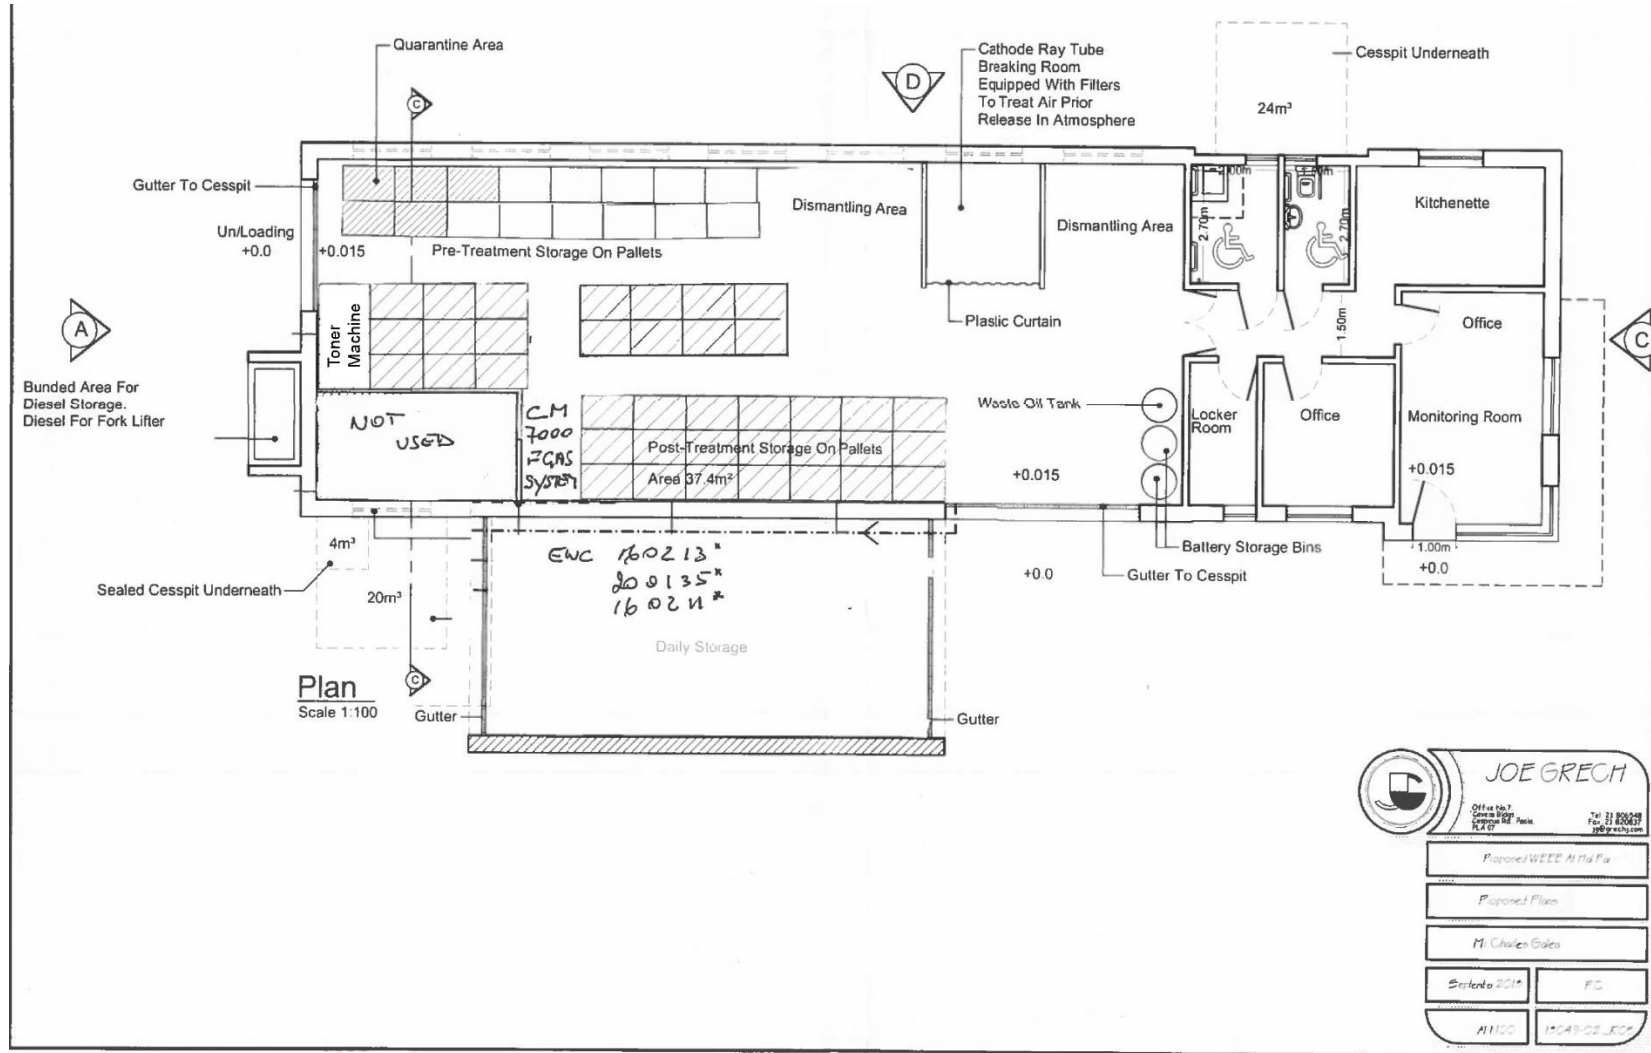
Internal Site layout plan for the carrying out of the activities specified in condition 1.1.1. The extent of the site boundary is indicative and shall not be used for interpretation purposes.
